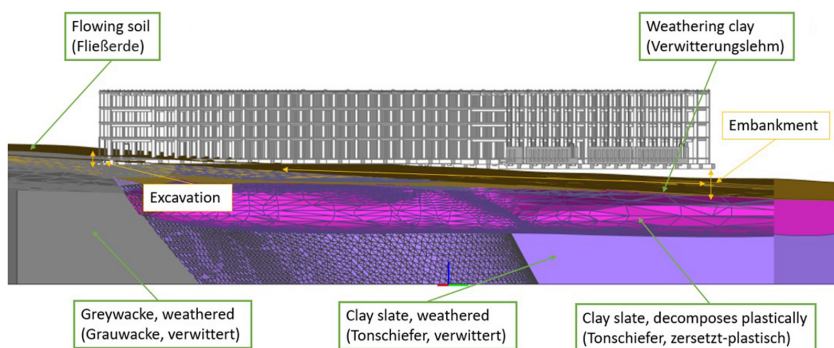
Cross section through building and site geology; problem of embankment consolidation
